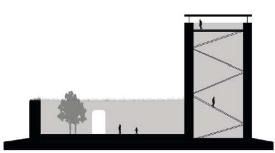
A cross section of the castle, showing the staircase and roof. Source(Gemeente Teylingen, 2015)
